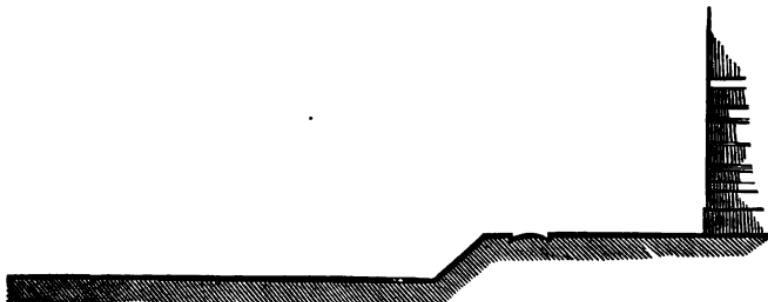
IMPROPER GRADING ABOUT DWELLING.
